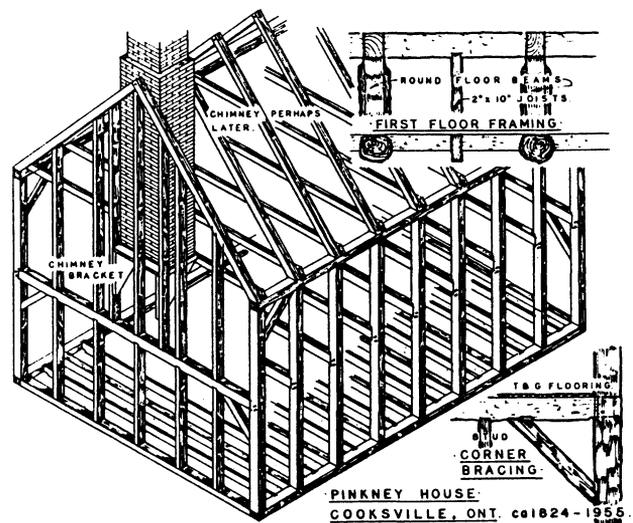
Canadian two-story anchor-bent framing, with attic joists above the wall plates. Pinkney house, Cooksville, Ontario, ca. 1824. From John Rempel, *Building with Wood and Other Aspects of Nineteenth-Century Building in Ontario* (Toronto: Toronto University Press, 1967), p. 121.
